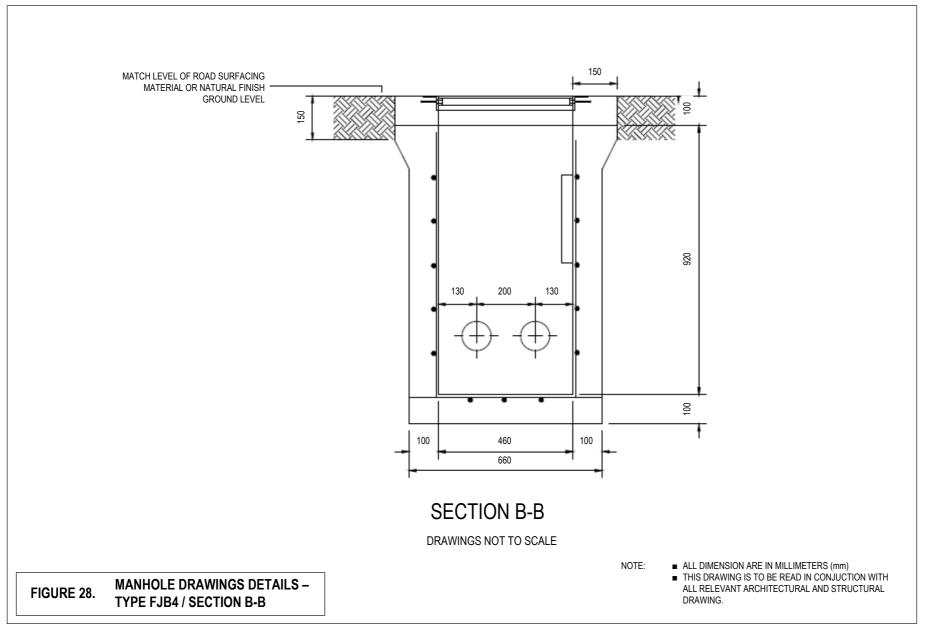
Manhole drawings details - Type FJB4 / section B-B
